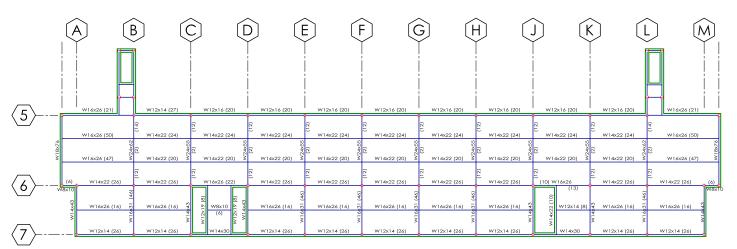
Shown above is the steel framing plan, including braced frames as highlighted
